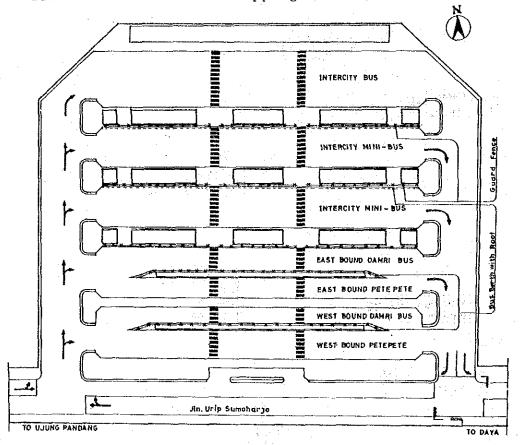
Terminal Panaikang Improvement Plan
